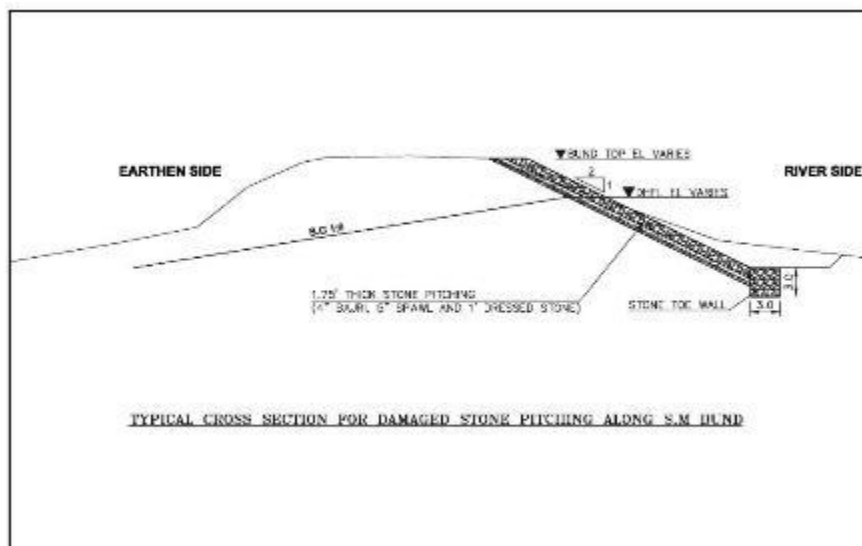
Typical Cross Section of Damaged Stone Pitching along S.M Bund
